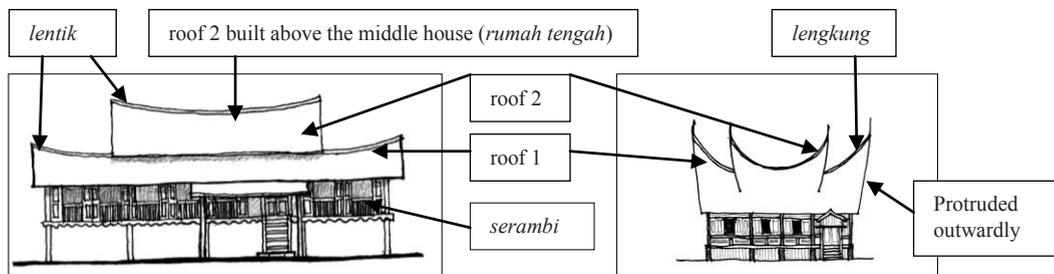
(a) Elevation of Negeri Sembilan traditional house; (b) Elevation Minangkabau traditional house
